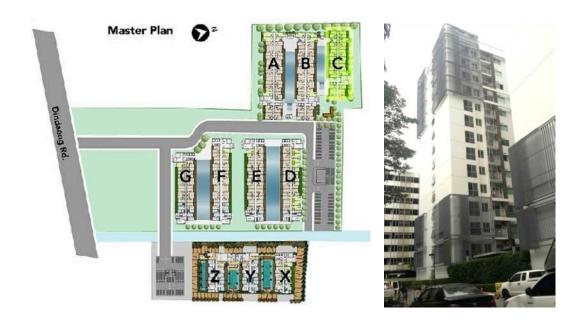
The pictures of privacy supportive characteristics of Condominium NB03 (Left) the typical floor plan, (Right) the building's floor stacking
